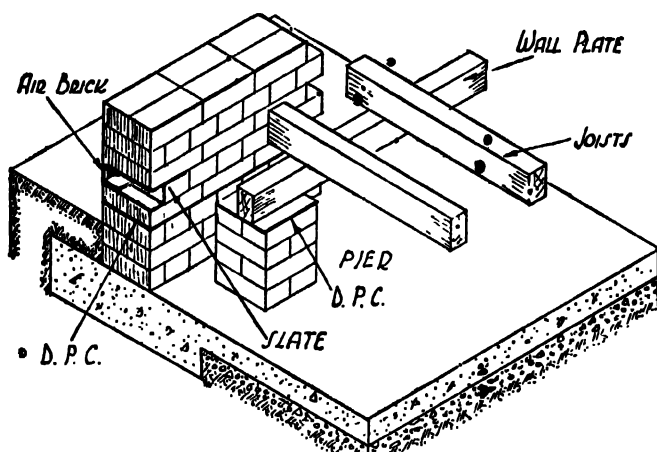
GROUND FLOOR CONSTRUCTION - PIER SUPPORT
